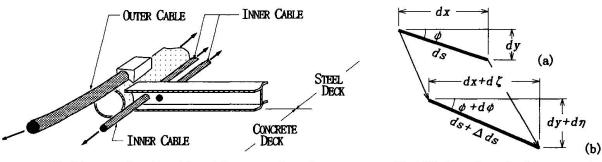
Inner and outer cables at the connection of steel and concrete decks.
